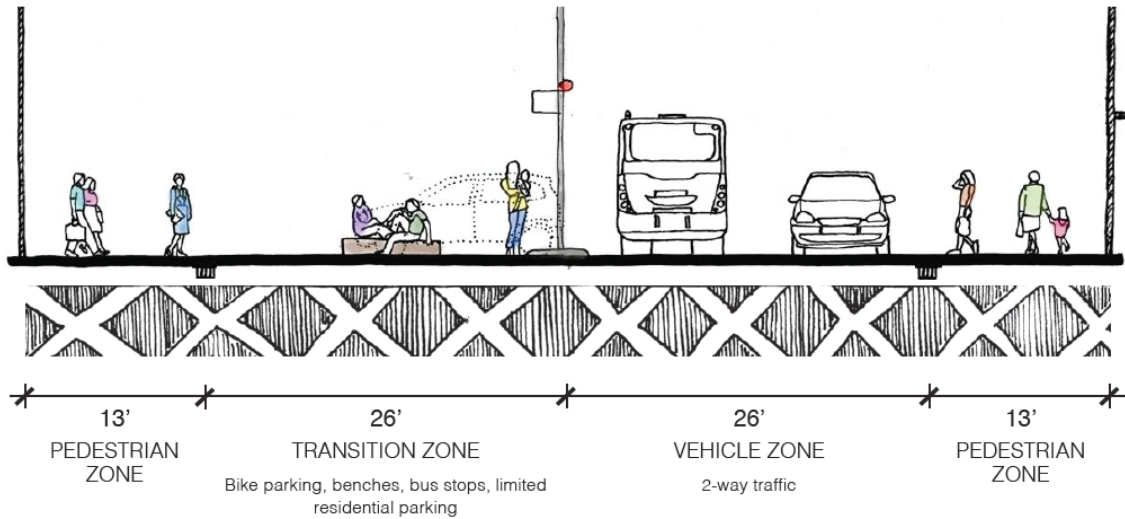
Typical Zone 2 roadway section. Source: Sarah Saviskas, Taking Back Our Streets.
